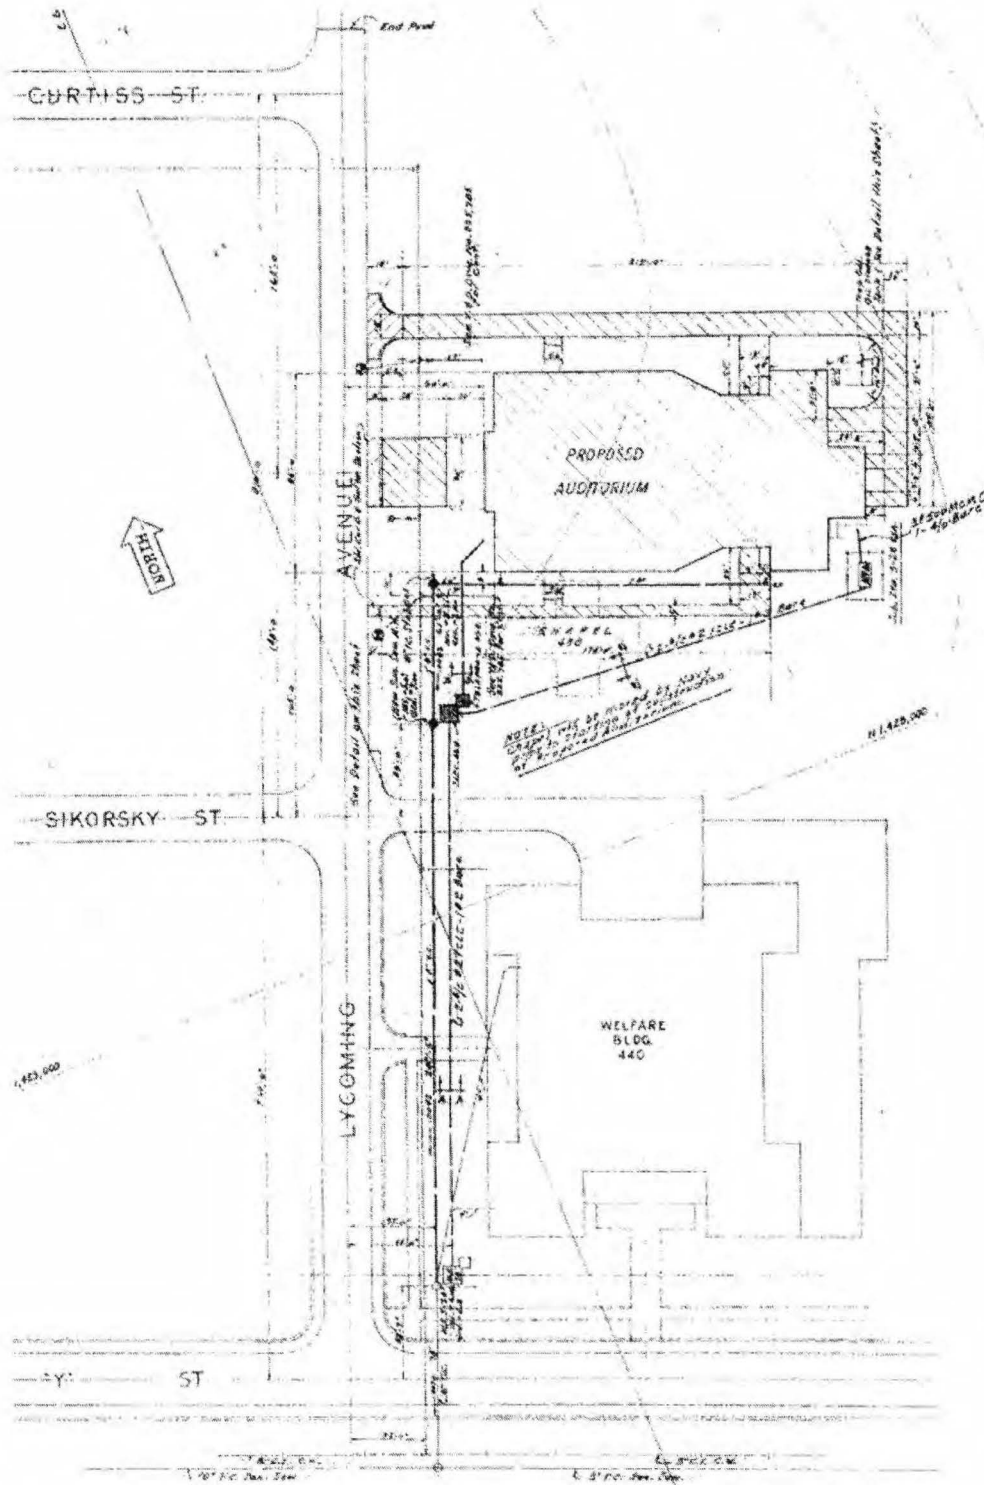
Portion of Original Plot Plan. (Y&D Drawing No. 325-775)
